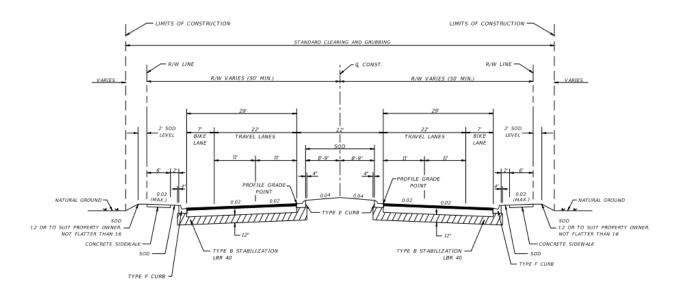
| Cross-section of the Proposed Northwest Crestview Bypass Alternative Corridor
